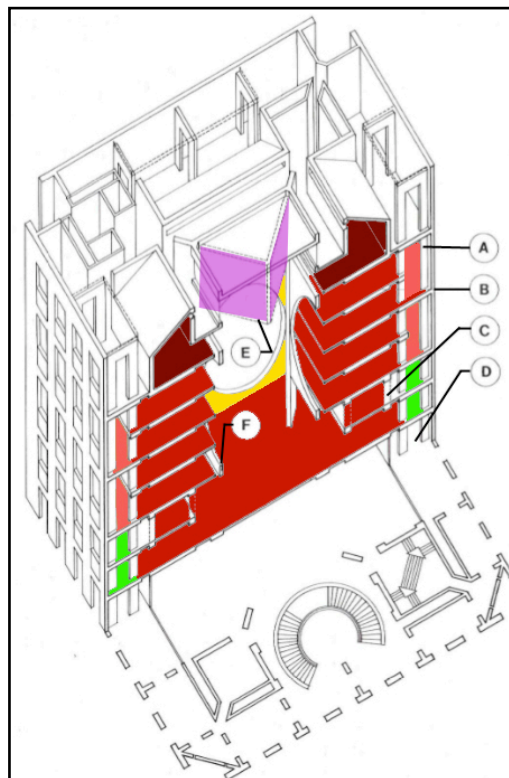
the space between interior concrete slab and exterior brick wall in first floor and Second floor is used for servant area which includes storage and MEP utilities (Ford, 1996, p.326)
